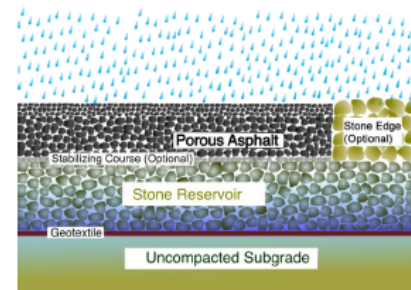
Cross section of typical porous asphalt pavement with stone reservoir (Image courtesy of FHWA)
